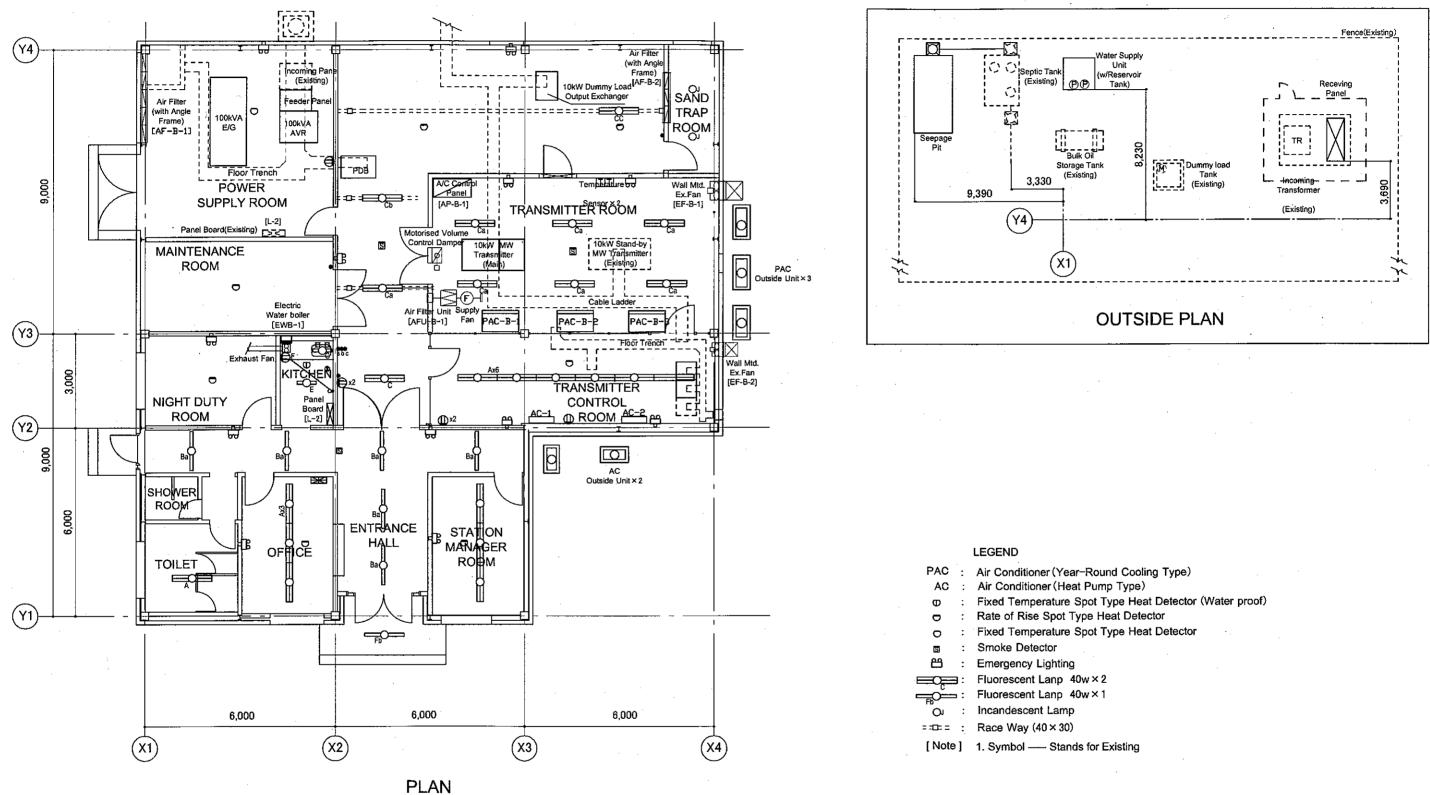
BARDIBAS 10kW TRANSMITTING STATION BUILDING RENOVATION PLAN (2)
